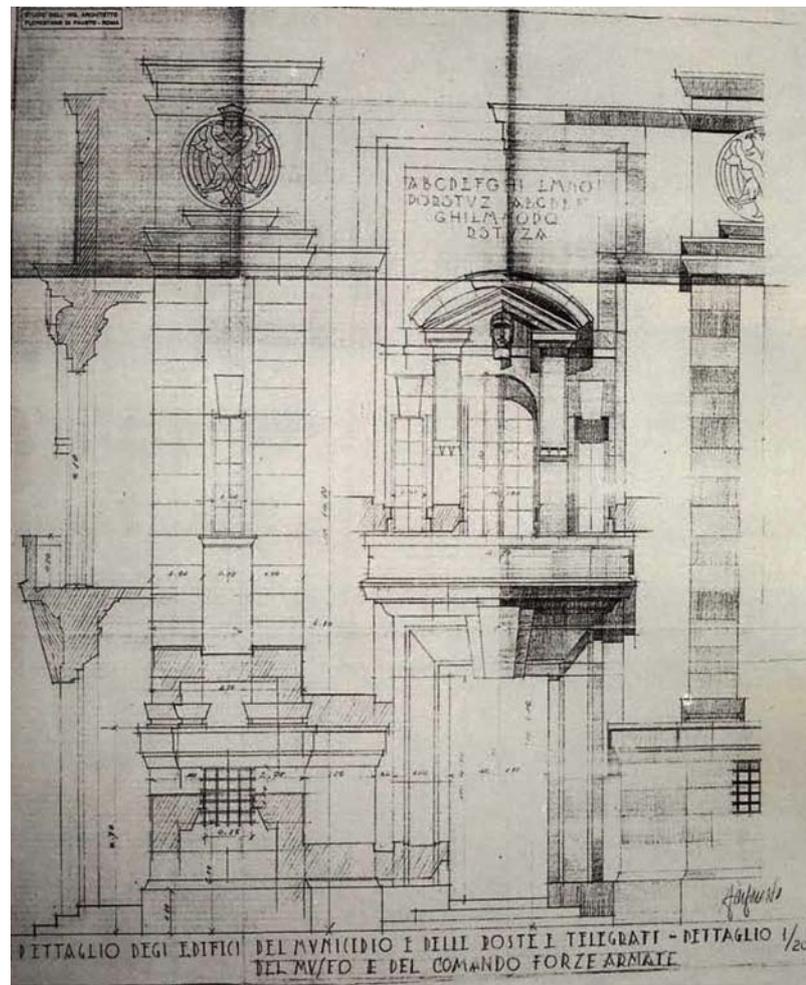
Façade detail of the project for the ministerial buildings by Florestano di Fausto. 1926-31
